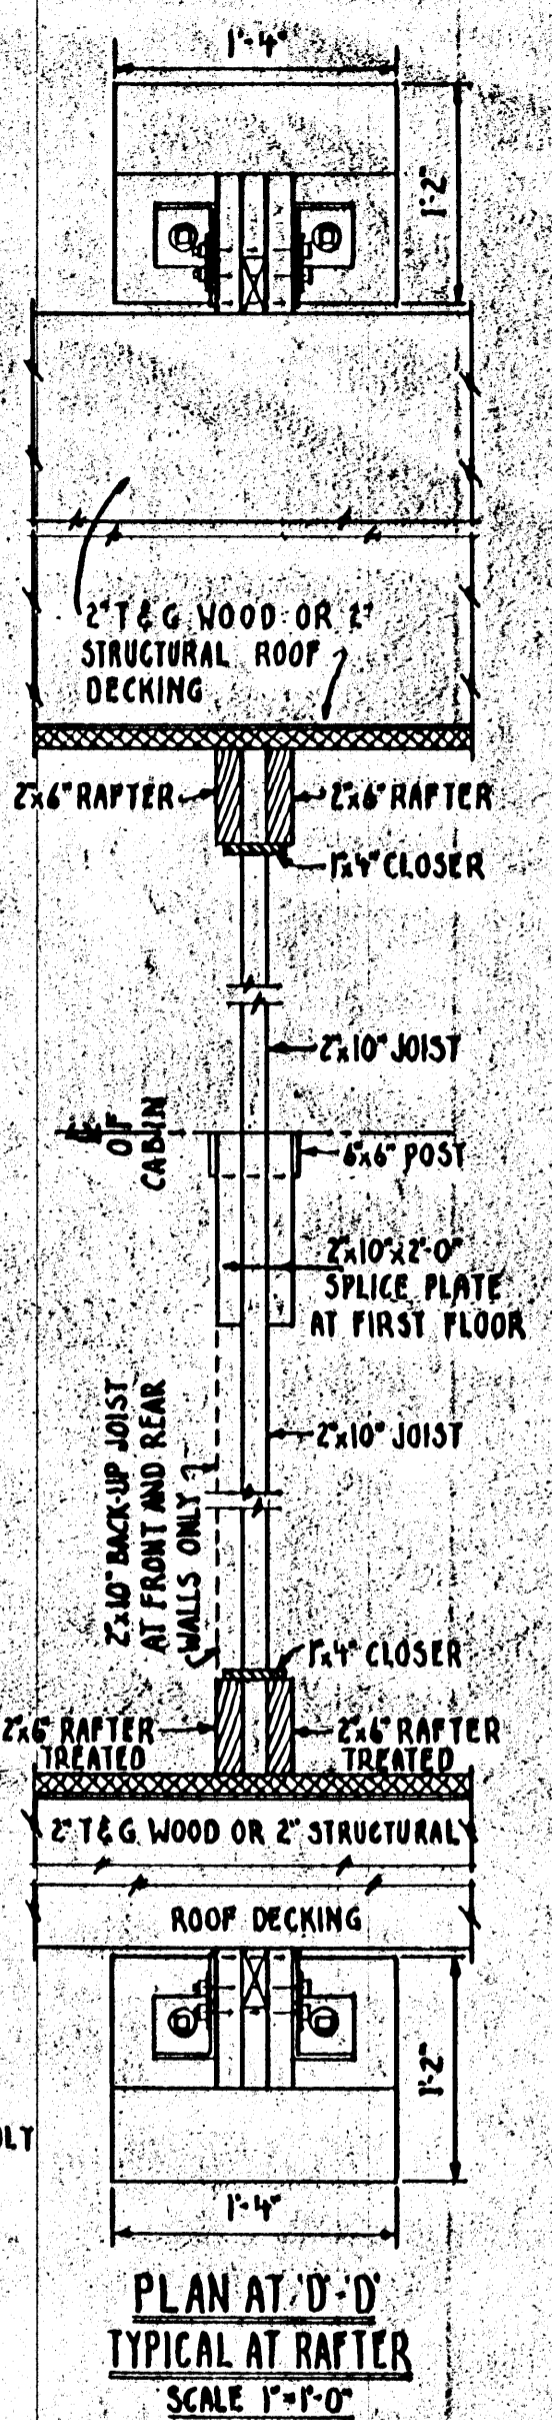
DETAIL OF FOOTING AND RAFTER CONNECTION
